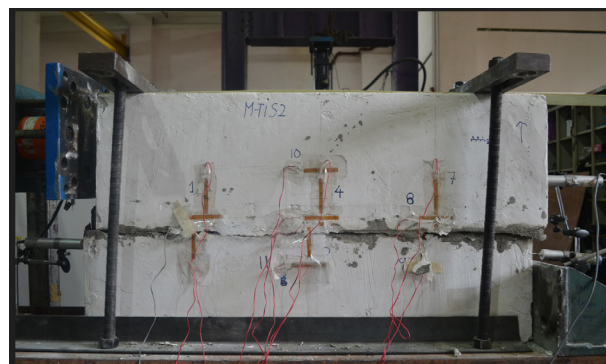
Condition of the proposed design model of wall-to-wall connection type 1, Dapped Wet (MT1S2) at failure.
